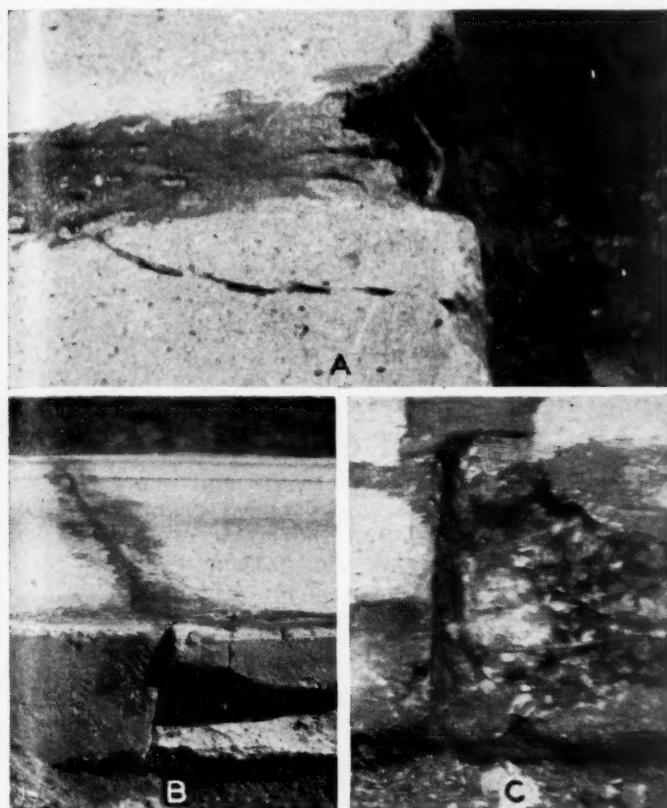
A, BUCKLED EDGE BAR OF A SMALL CORNER FAILURE; B, SMALL CORNER FAILURE AT A JOINT; C, SMALL CORNER FAILURE ON RELATIVELY NEW REINFORCED PAVEMENT.
